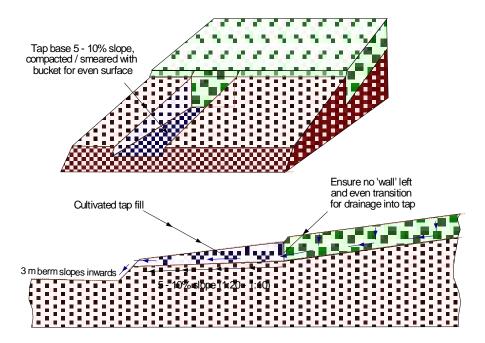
Drainage tap (meeting drainage berm). Top: view prior to loose infill
